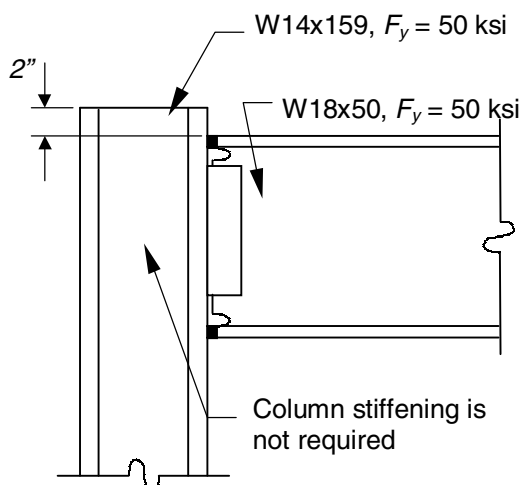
Framing arrangement for Example 6-10 (Solution A).
